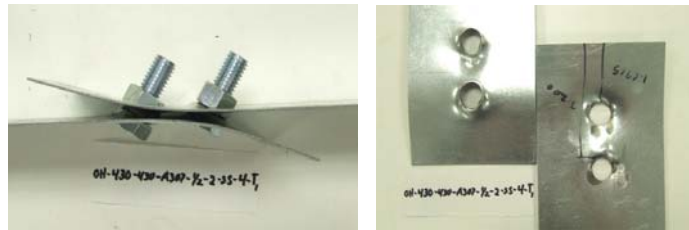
Failure mode of single shear connection OH-430-430-A307-1/2-2-SS-4-T1
